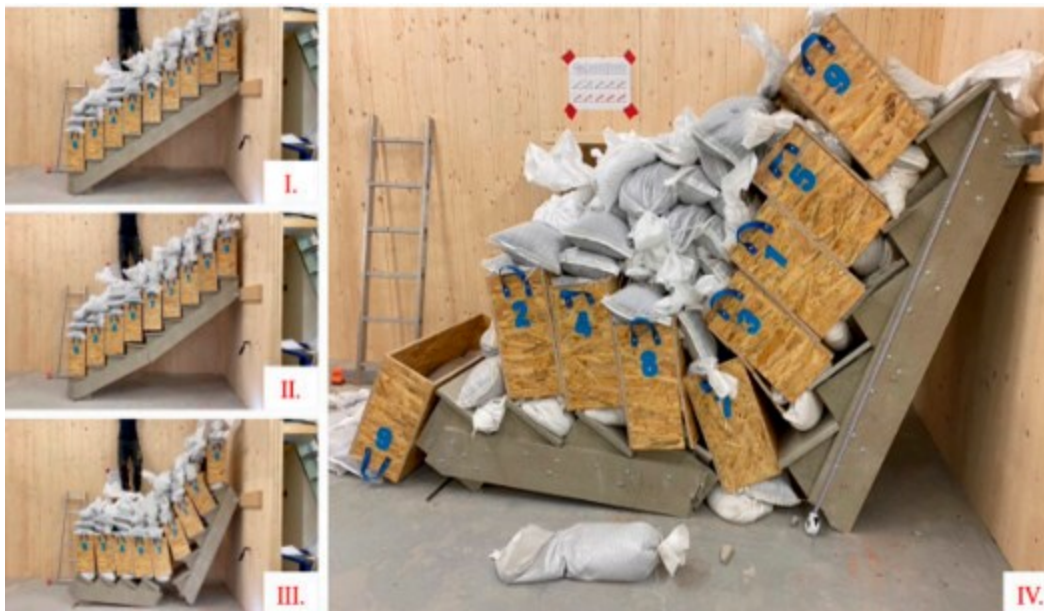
The cement fibre board internal staircase structure collapse [26].
